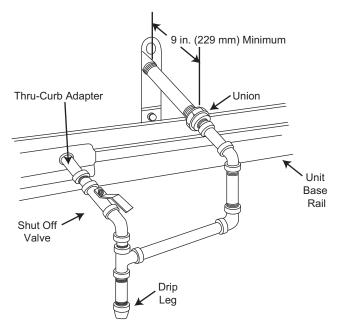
Gas Piping, Typical Curb Sidewall Piping (Example 1)
